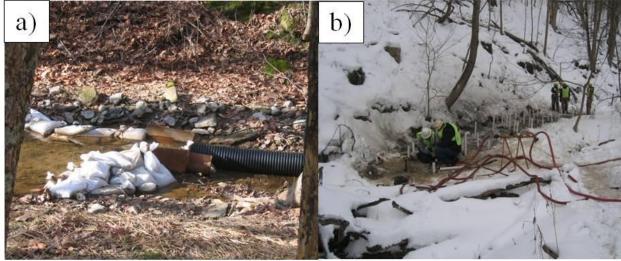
Grouting operation procedures. First, a) stream flow must be collected and diverted around the area where grouting will occur - shown at stream 32532 in Bailey Mine and then b) boreholes are drilled and clay pumped into fractures - shown at stream 32740 in Enlow Fork Mine (Photographs from PA DEP files).
